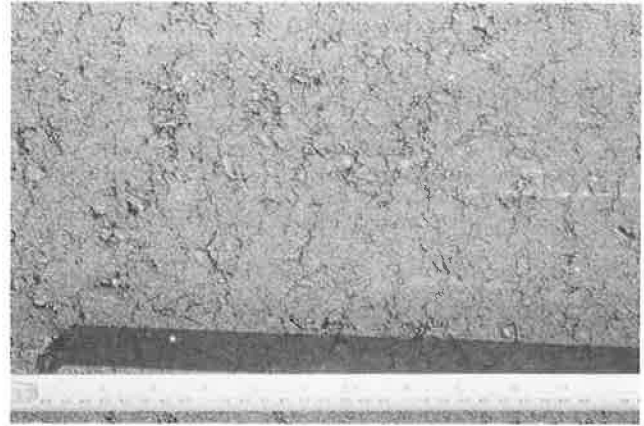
Construction cracks on a paved sidewalk.
